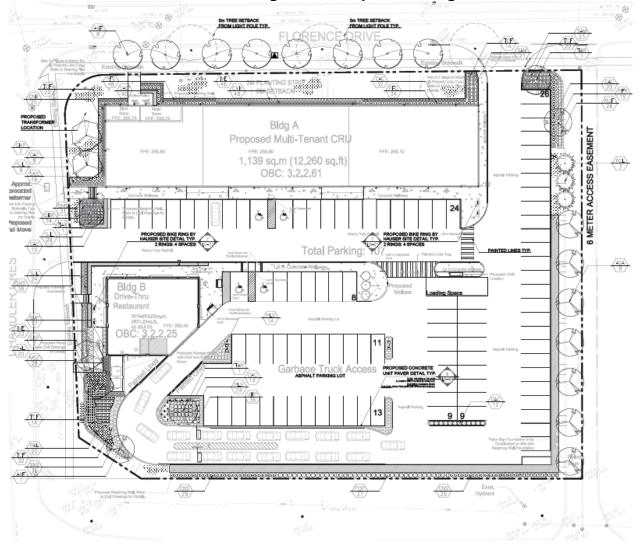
Exhibit B – Site Plan Drawings, Site Plan, Page 1 of 6
